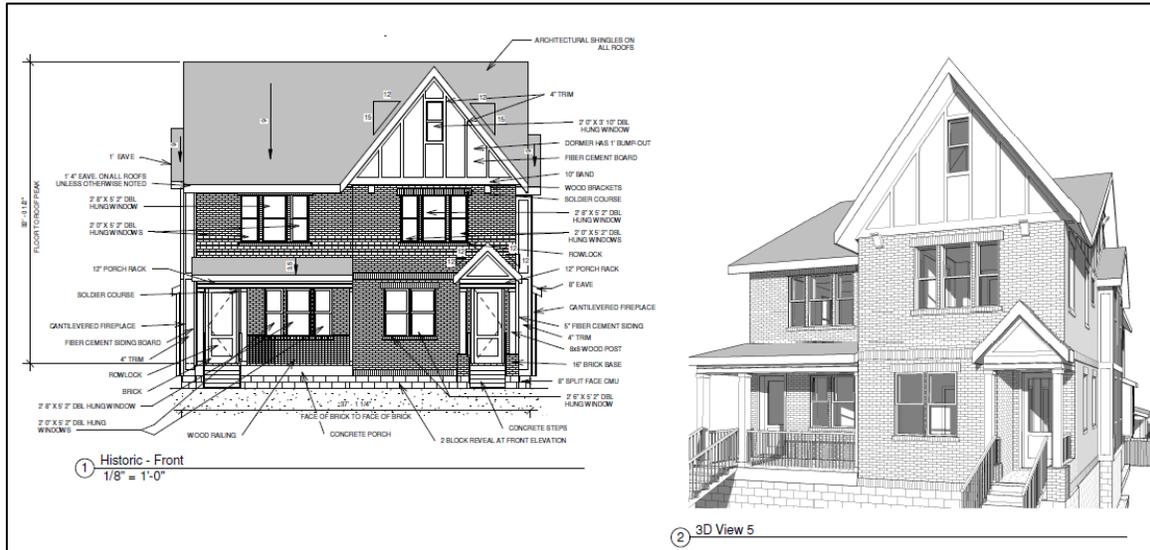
Front elevation and rendering of recently approved infill at 1820 Fourth Avenue North.
